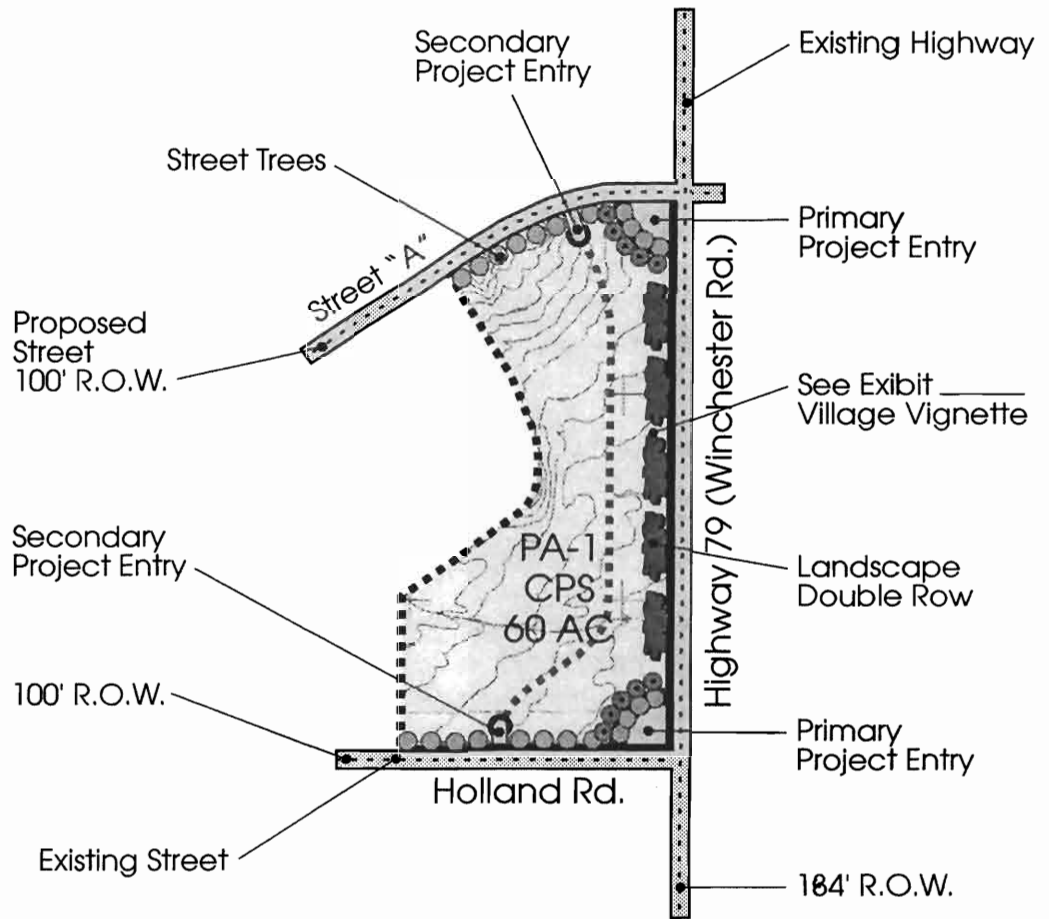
shows Planning Area 1 and its relationship to roads and adjacent planning areas. As shown, access to the planning area will be taken from Holland Road and "A" Street. Cross-access between Planning Area 1 and Planning Area 5 shall be allowed if individual project designs warrant.
